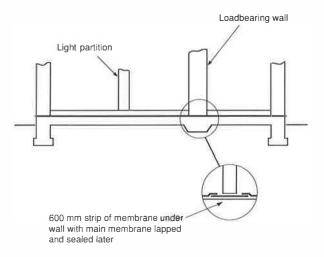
Avoidance of breaking the radon-proof barrier beneath internal walls
